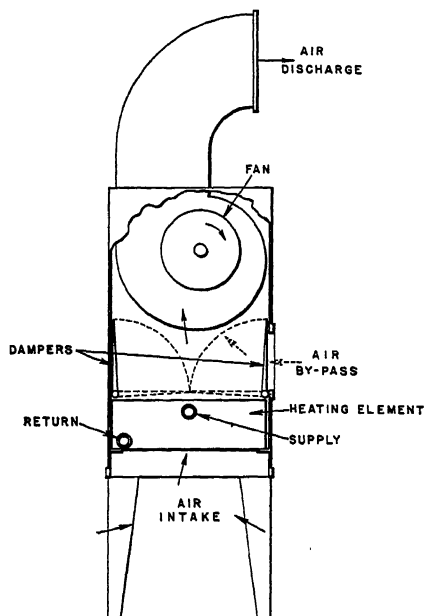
FLOOR MOUNTED UNIT HEATER, HOUSED TYPE FAN
